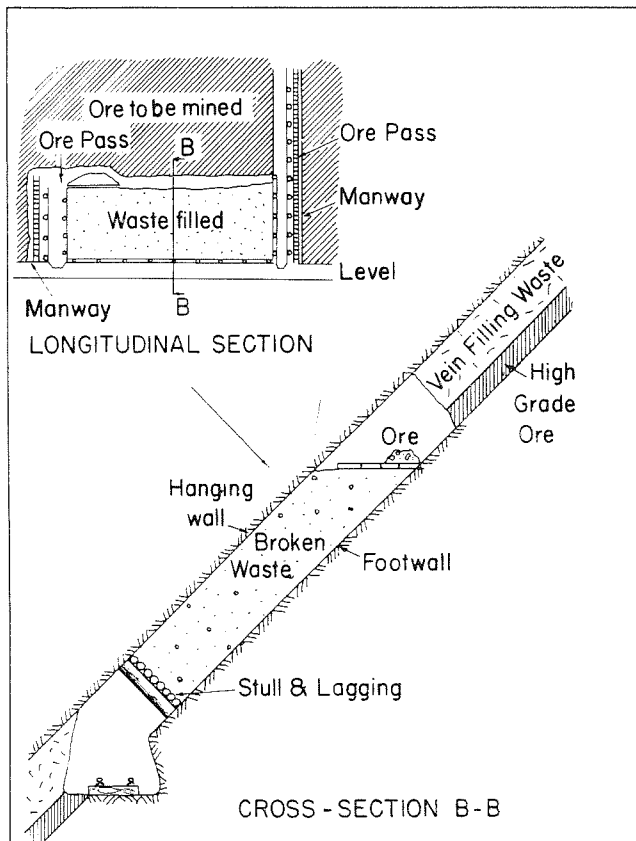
Longitudinal and cross-sections illustrating the resuing or stripping system of mining.
